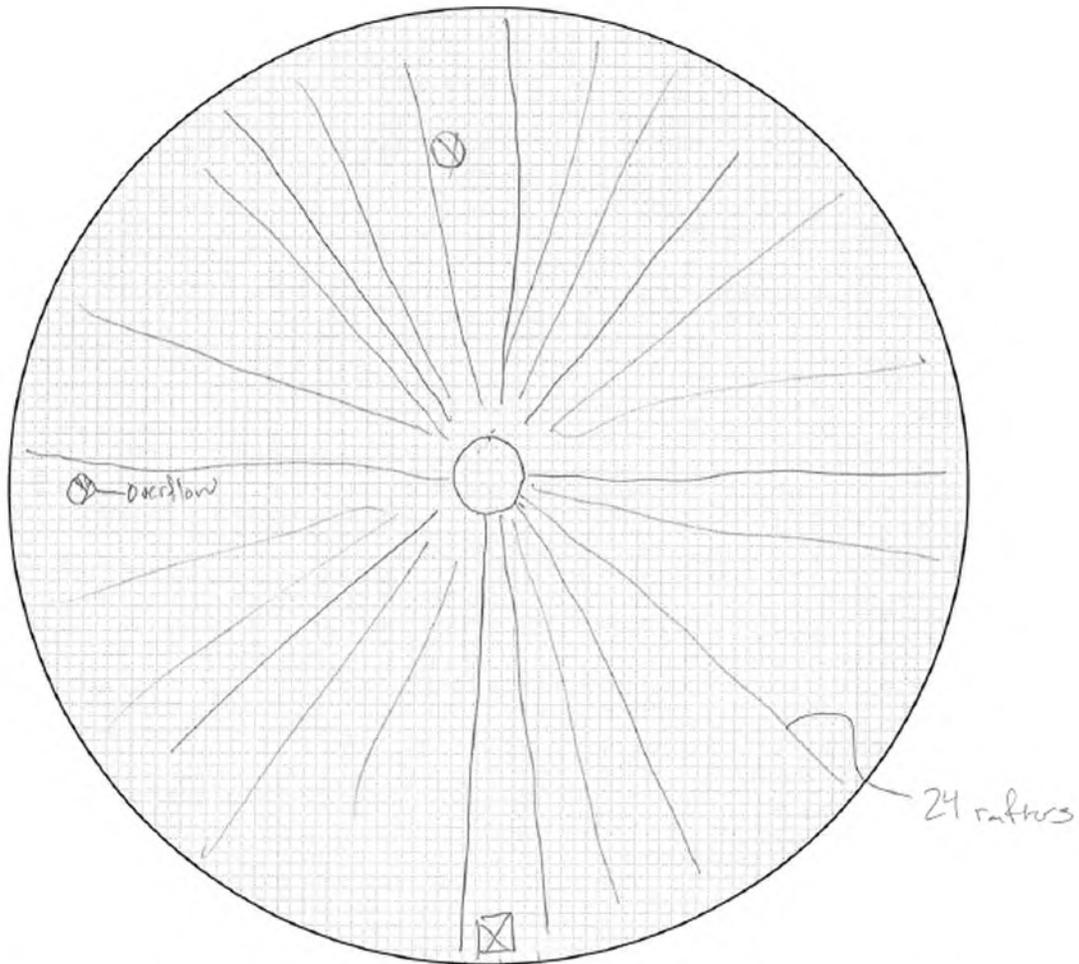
Reservoir REFLECTED ROOF AND RAFTER Plan – Sketch location of roof supports, hatches, vent, columns, etc. List given and measured diameters.
